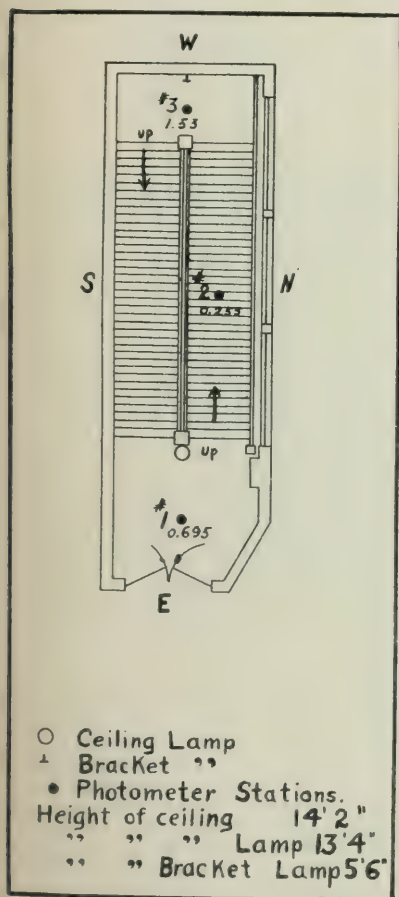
Section plan showing typical stairway, showing location of lighting units, test stations and illumination data.
